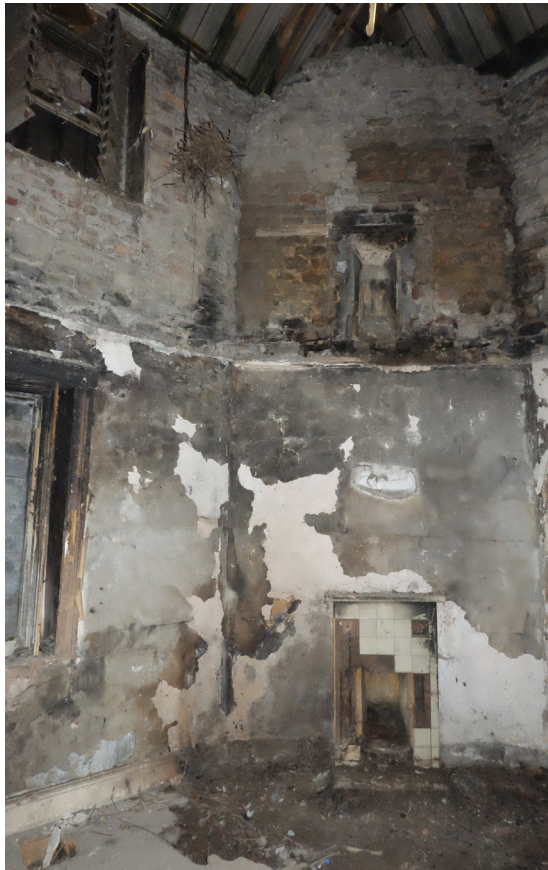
Southwest corner Fireplaces in very poor condition. Brick chimney breast at upper floor not bonded into wall
